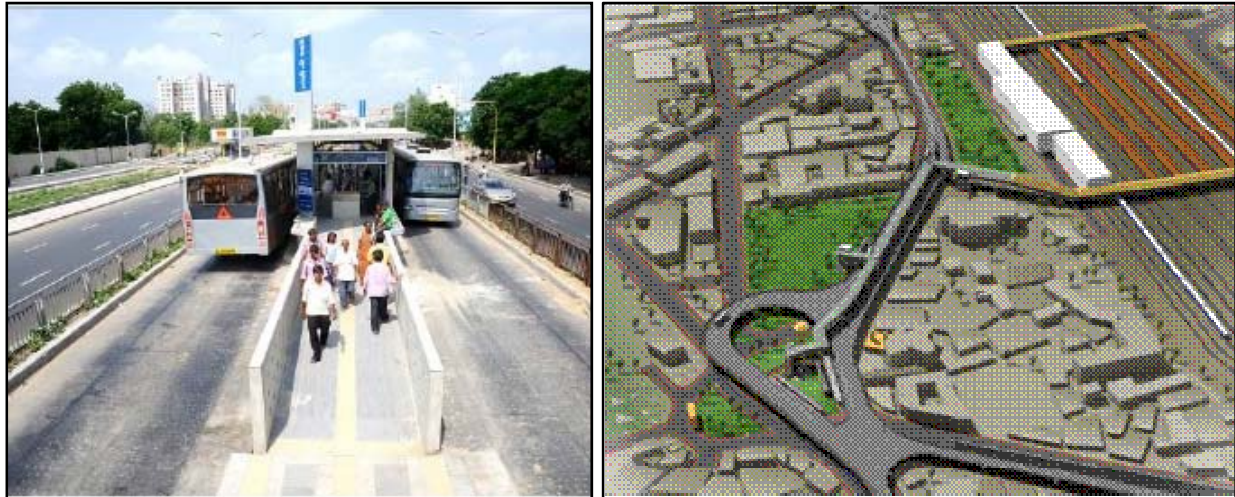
Ramp and Access to Bus Station and Elevated BRT at Kalupur
